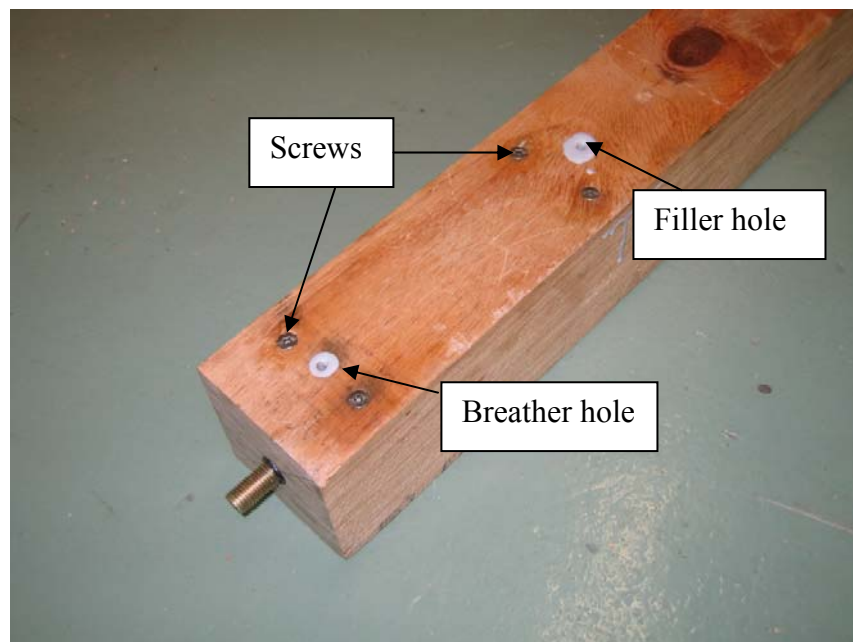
Test specimen cast using West System, showing screws, filler and breather holes.
